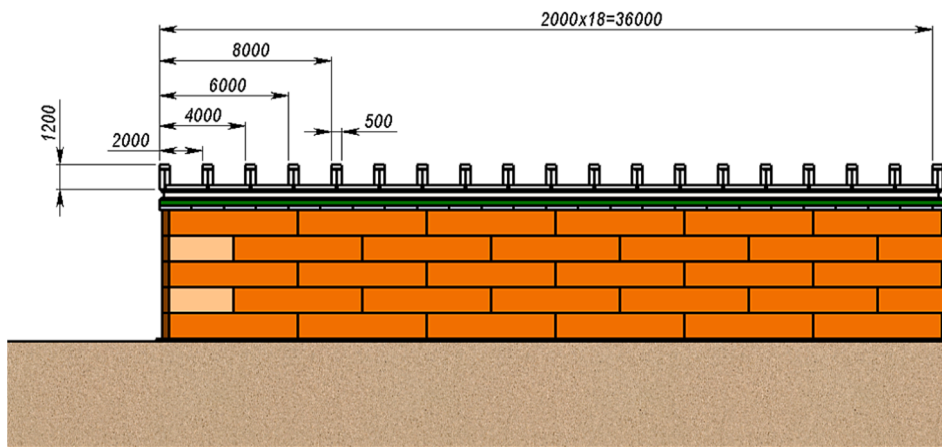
Fragment of the storage facility bearing structures of the engineering barrier on the flooring.
